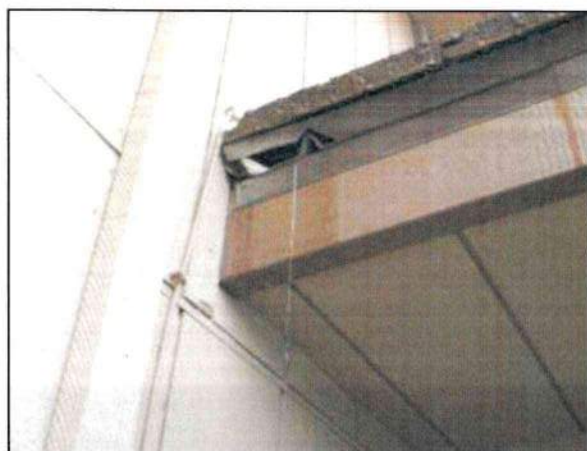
Fire Station #4 The section of roof near the front entry exhibits poor flashing.
